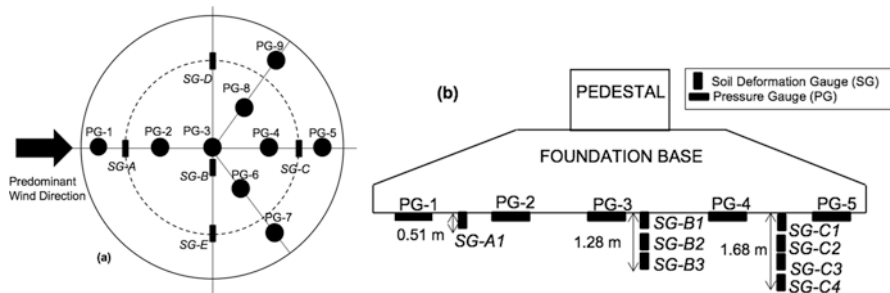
Instrumentation layout underlying WTG foundation: (a) plan view and (b) cross-sectional view
